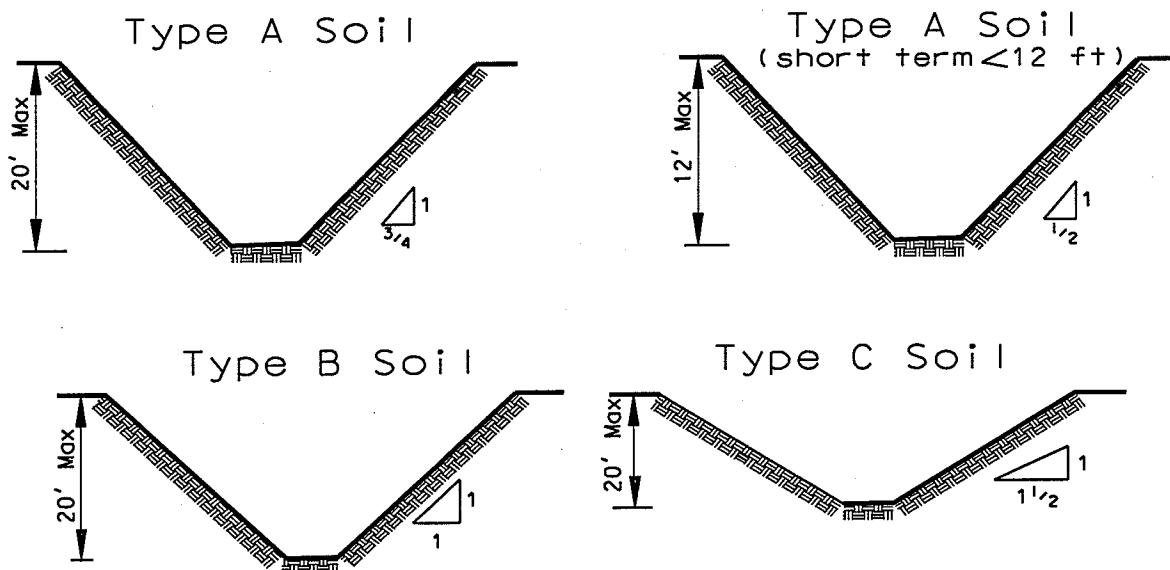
Allowable Side Slopes for Excavation < 20 feet
